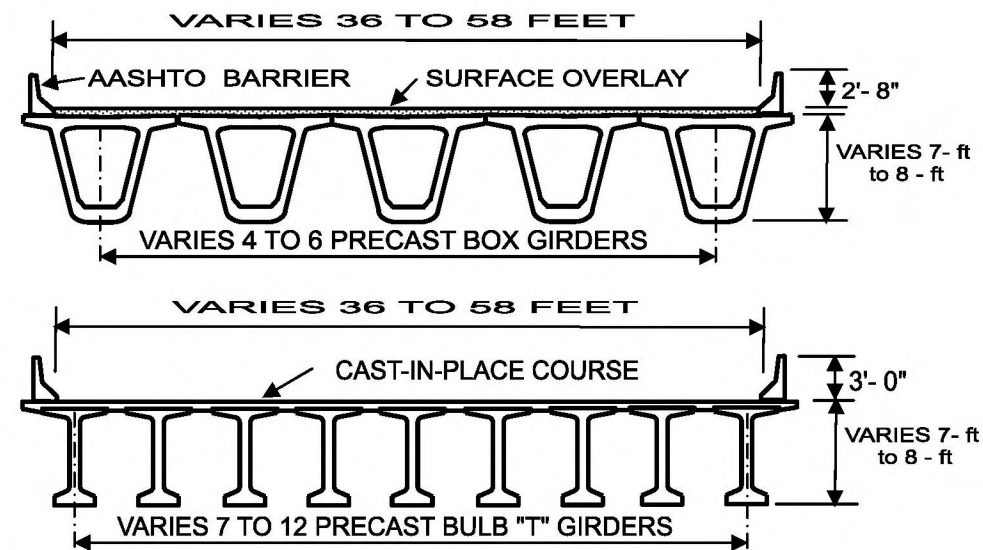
Multiple Precast Box (top) and “T” Girders
